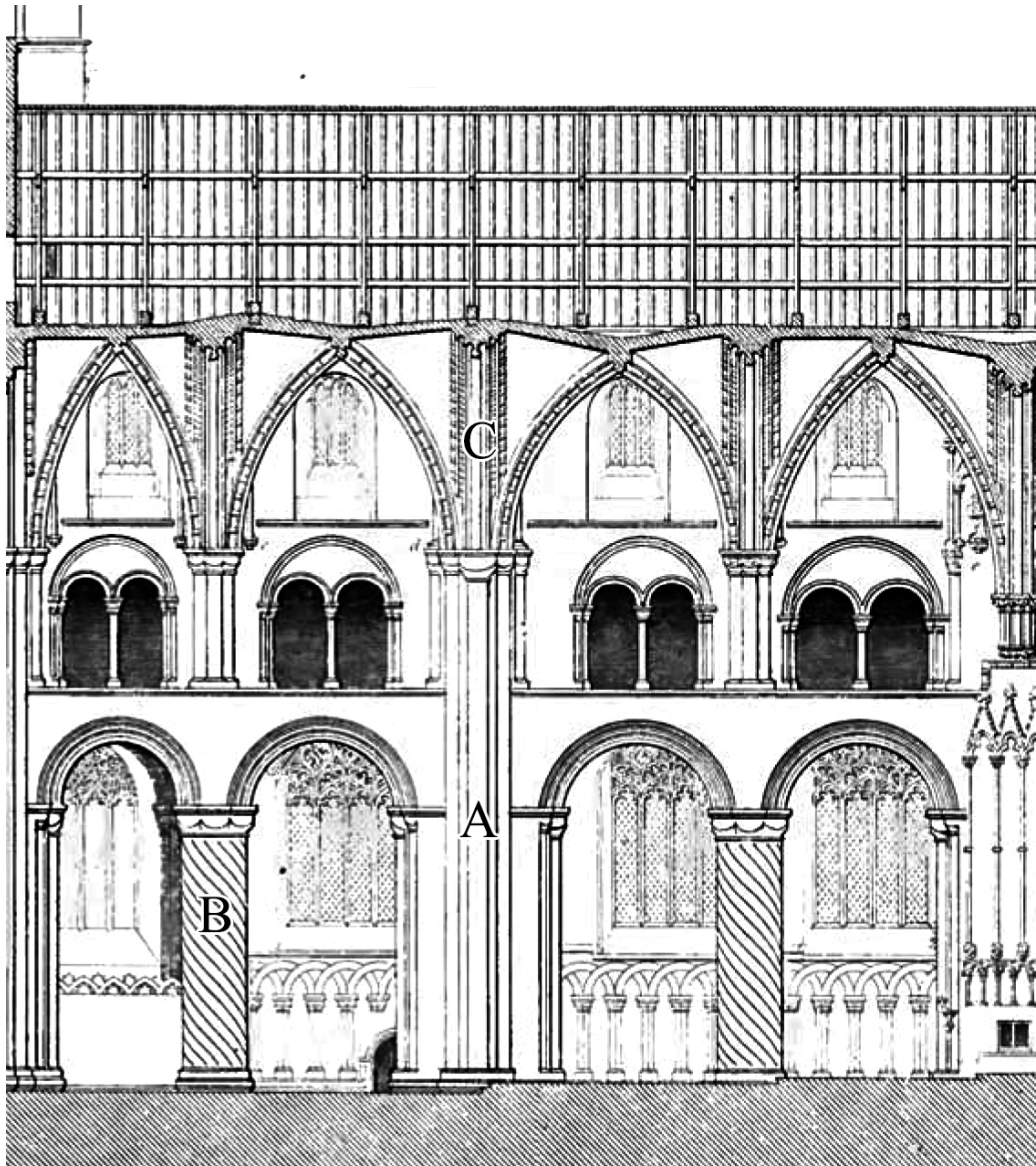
Choir elevation (from Billings 1843). A=large compound pier; B=cylindrical column; C=transverse arch.
